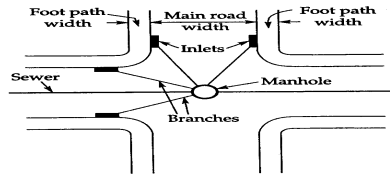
Showing the locations of storm sewer inlets at street intersections. [Note. Branch lines enter at manholes. The arrows show the direction of storm runoff in the streets.]
